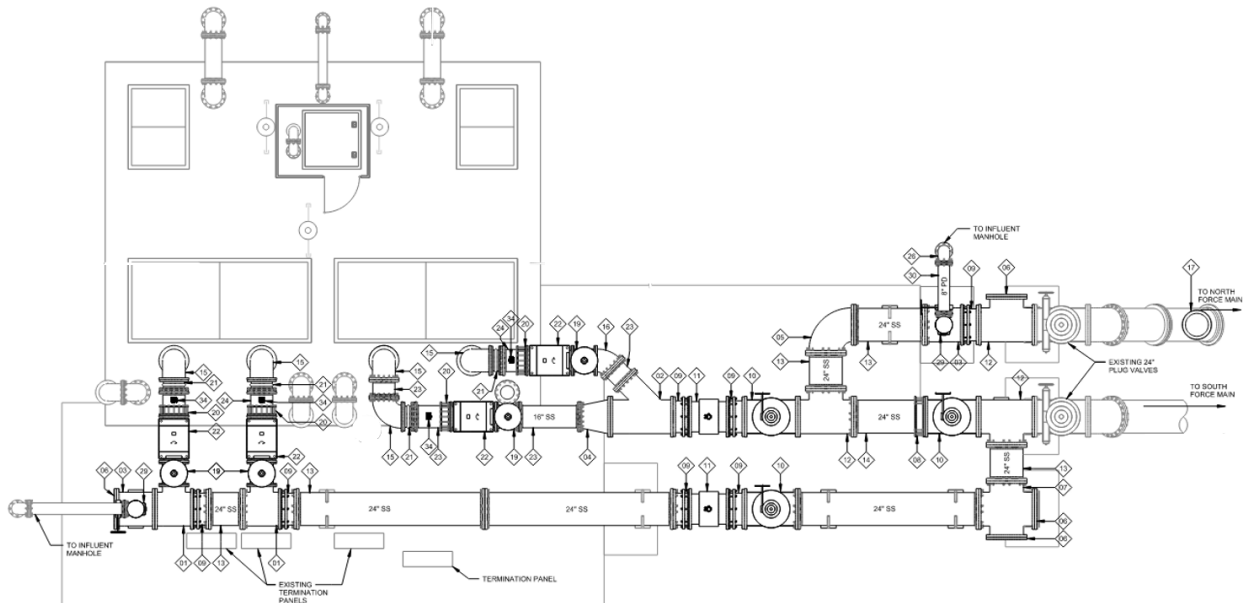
Proposed Lift Station 66 Improvements Plan
